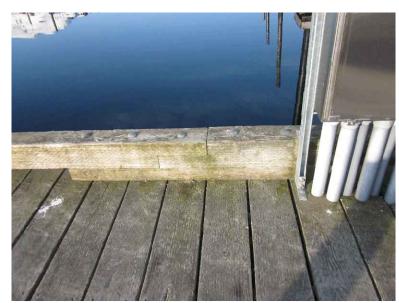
TYPICAL SPLICE BETWEEN FLOAT MODULES.
